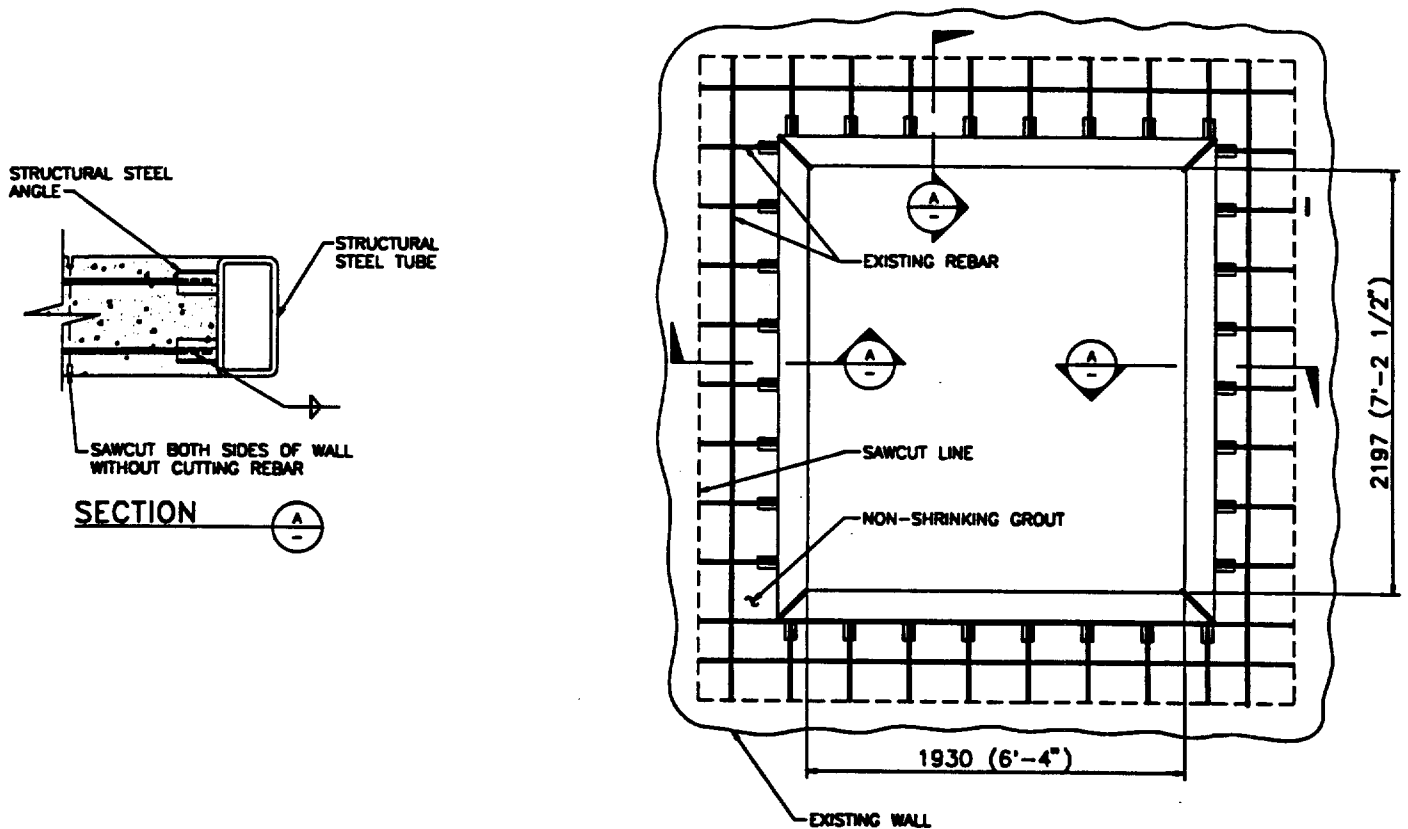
Details for strengthening at new wall openings to restore out-of-plane bending capacity.
